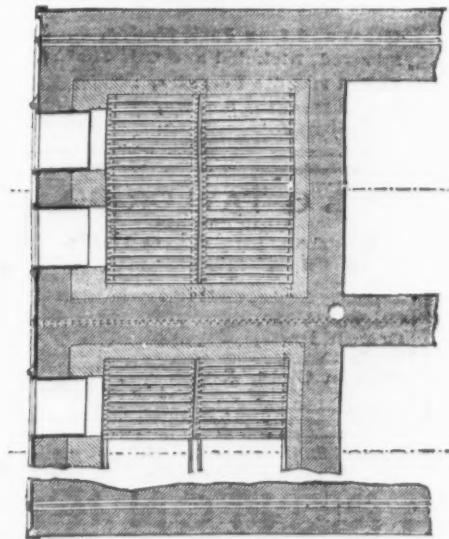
Horizontal Section through Brickwork on Line of Grate.
